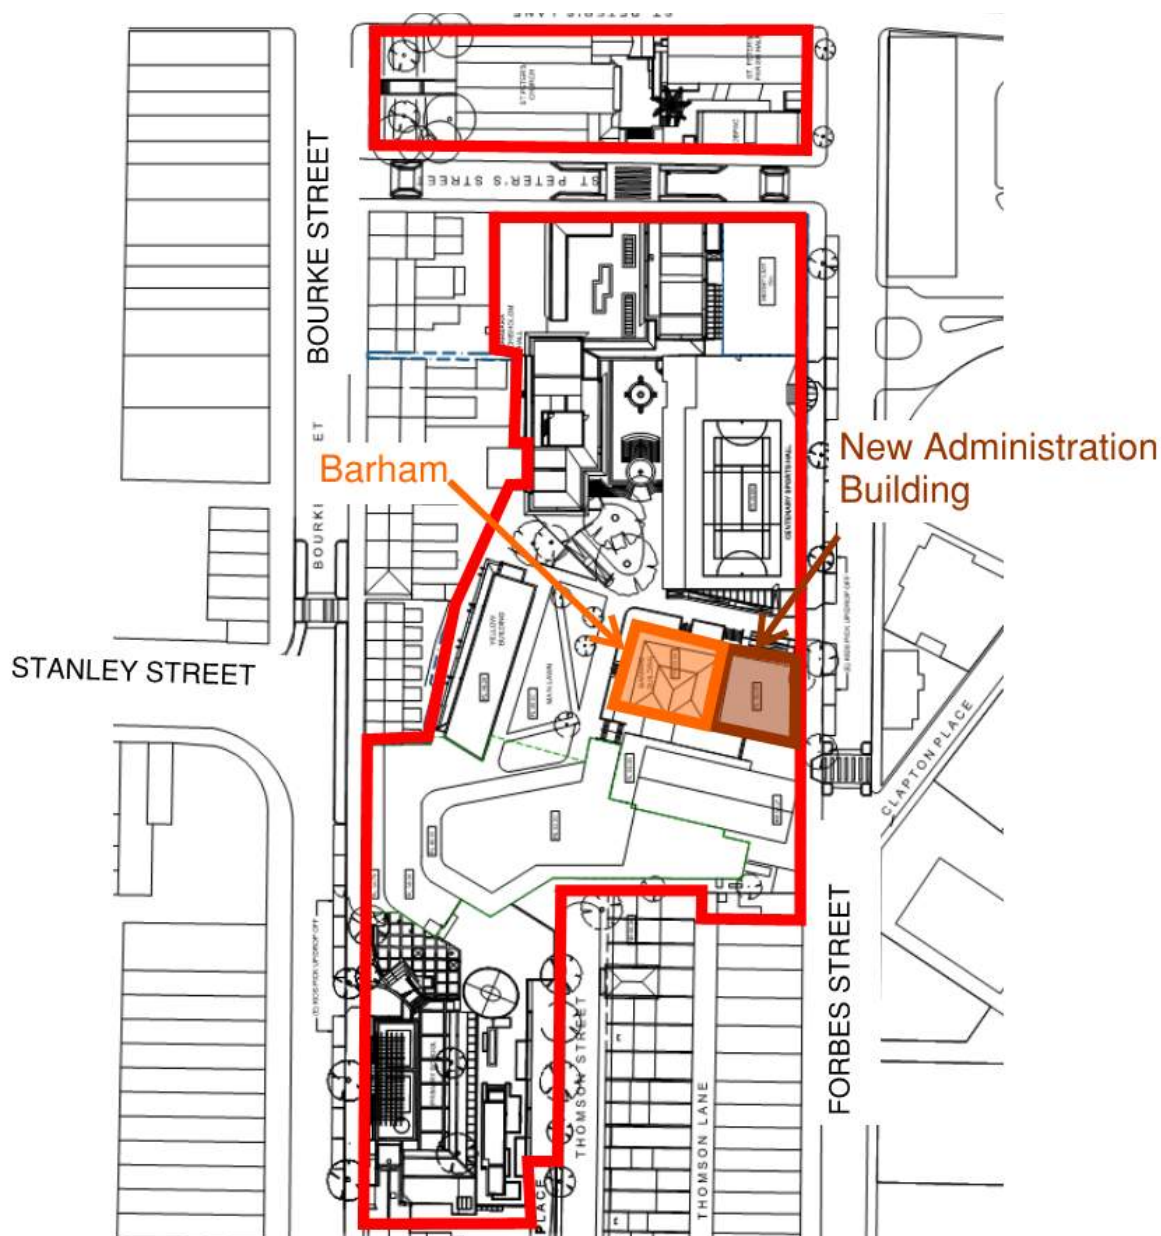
Barham and Administration Buildings (SCEGGS Darlinghurst 2040 Masterplan, 2018)
